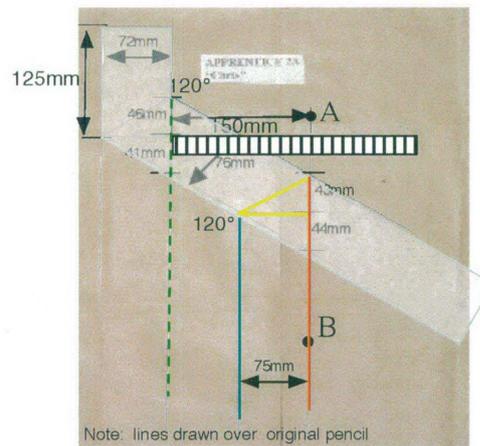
Chris: Drawing the offset and second bend to full size.
